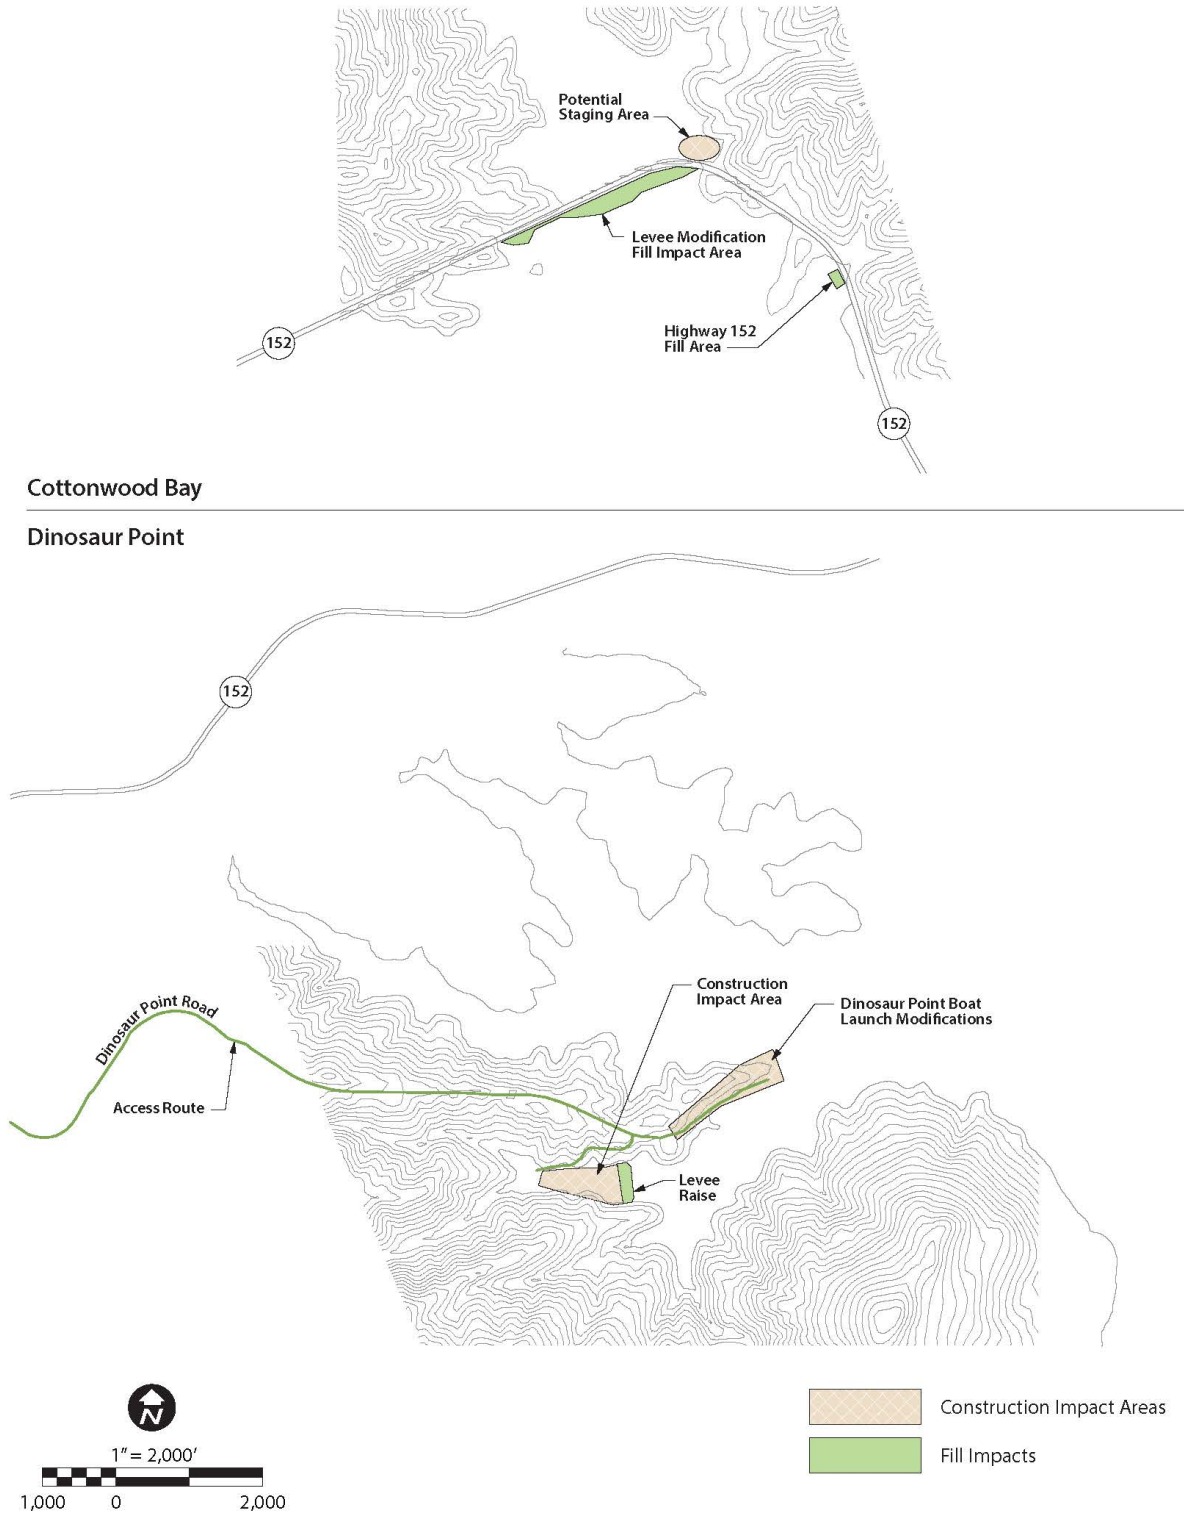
State Route 152 and Dinosaur Point Facilities and Construction Areas
